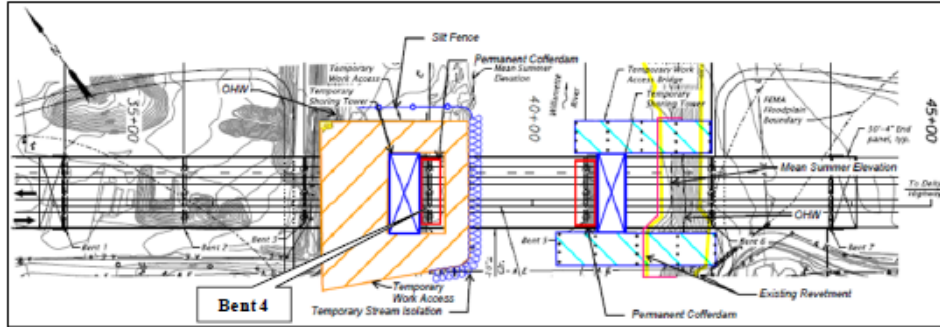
New Willamette River Arterial Bridge plan view showing the location of Bent 4 in the gravel bar.
